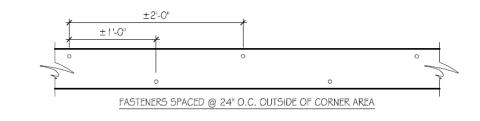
B - TYPICAL ROOF EDGE WOOD BLOCKING - SCREW FASTENER ANCHORAGE
